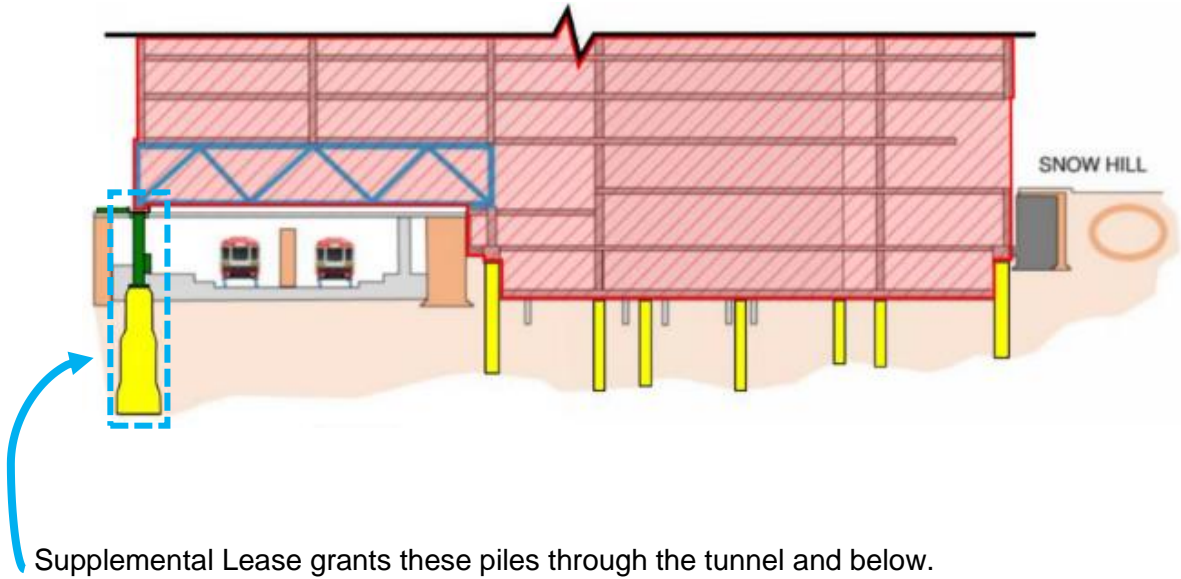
Existing and New Piles including New Basement Secant Wall and Caisson Piles (BLUE). Existing Abutments (BROWN).
